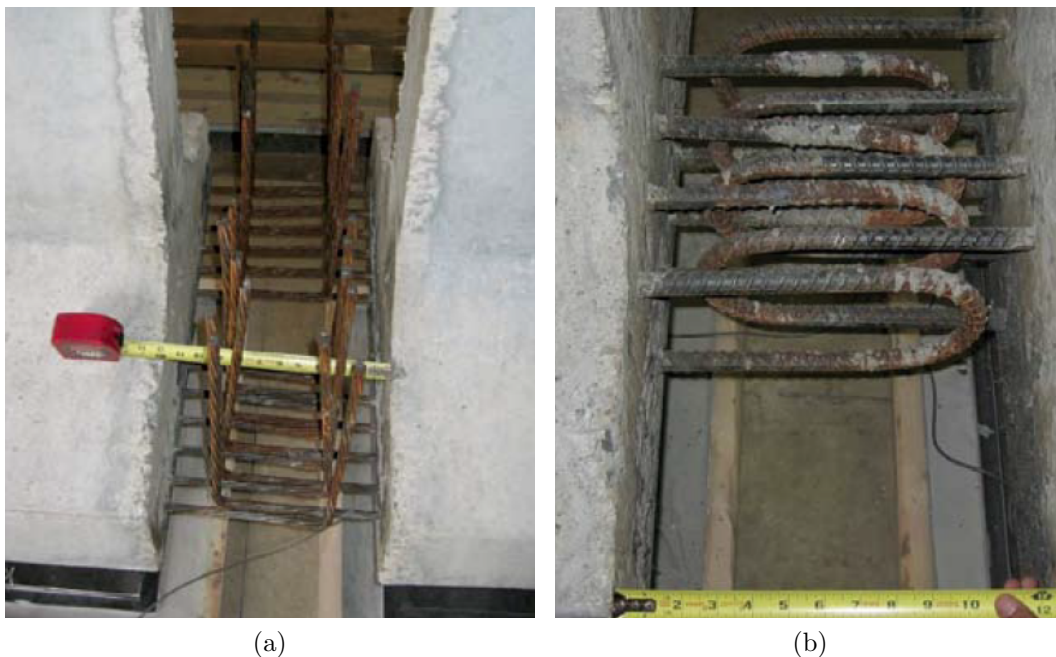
Bent Extended Strand and Reinforcing Bar Details ([Newhouse et al., 2007](#))
